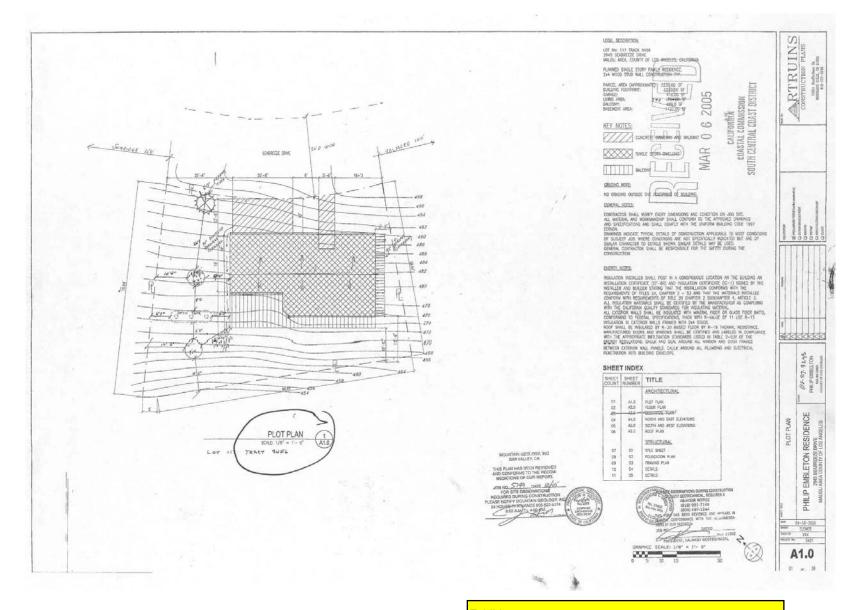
CDPA No. 4-06-001 Plot Plan
